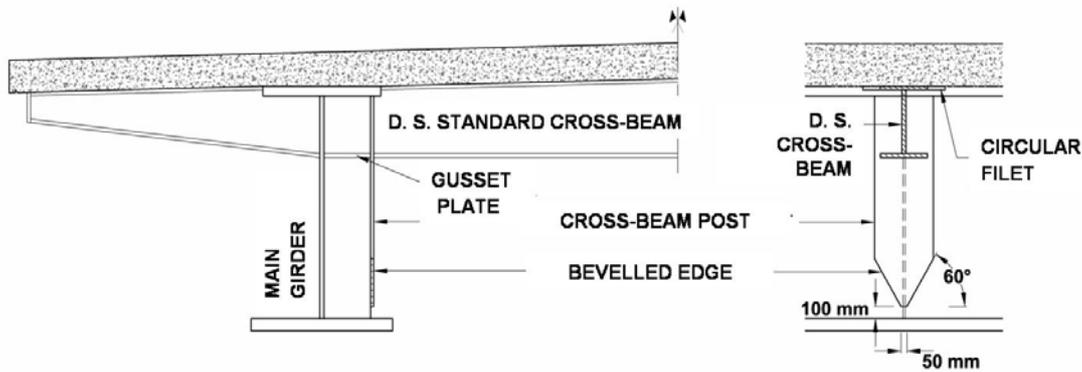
Main girder / Directly supporting cross-beam connection (standard case)
